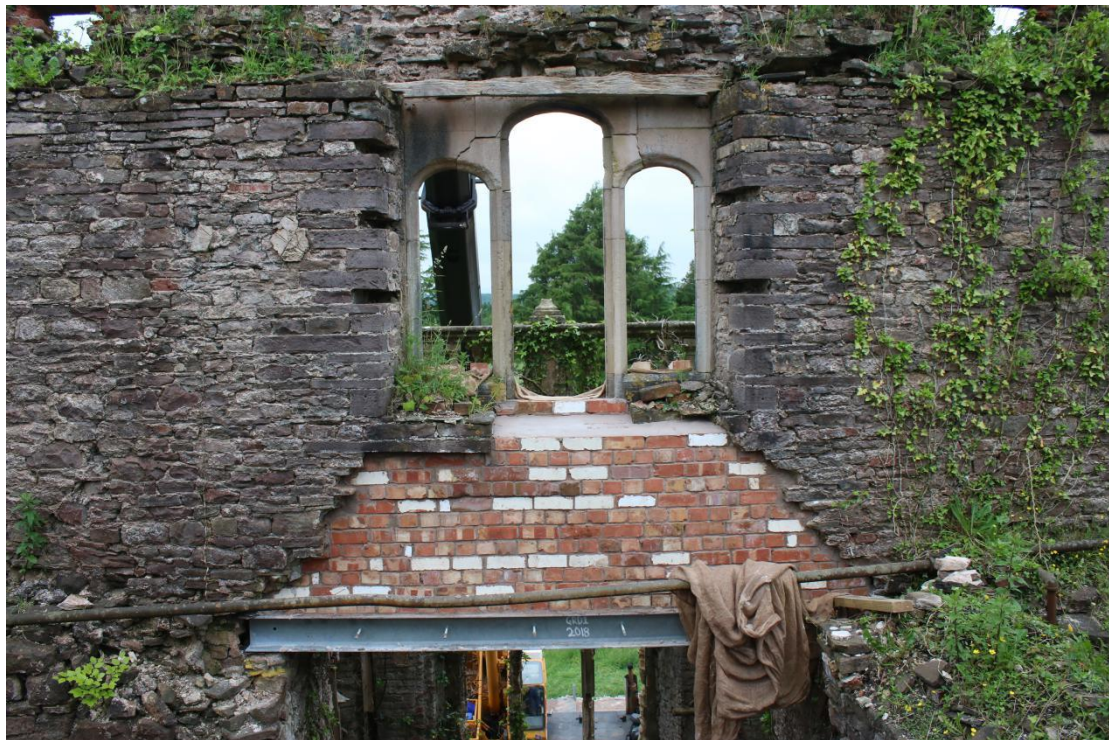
AD042_WB_158 - South window, showing supporting brickwork complete to interior.
